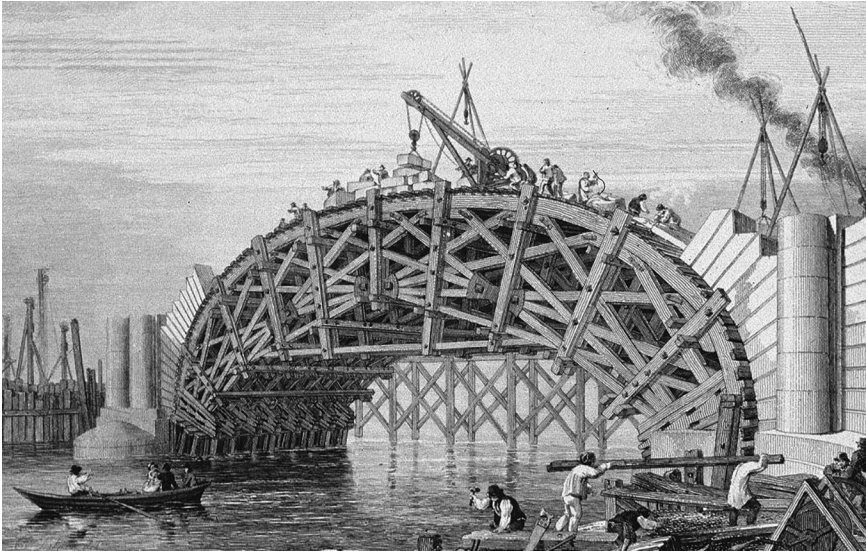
Wooden centering used in the construction of the Waterloo Bridge
